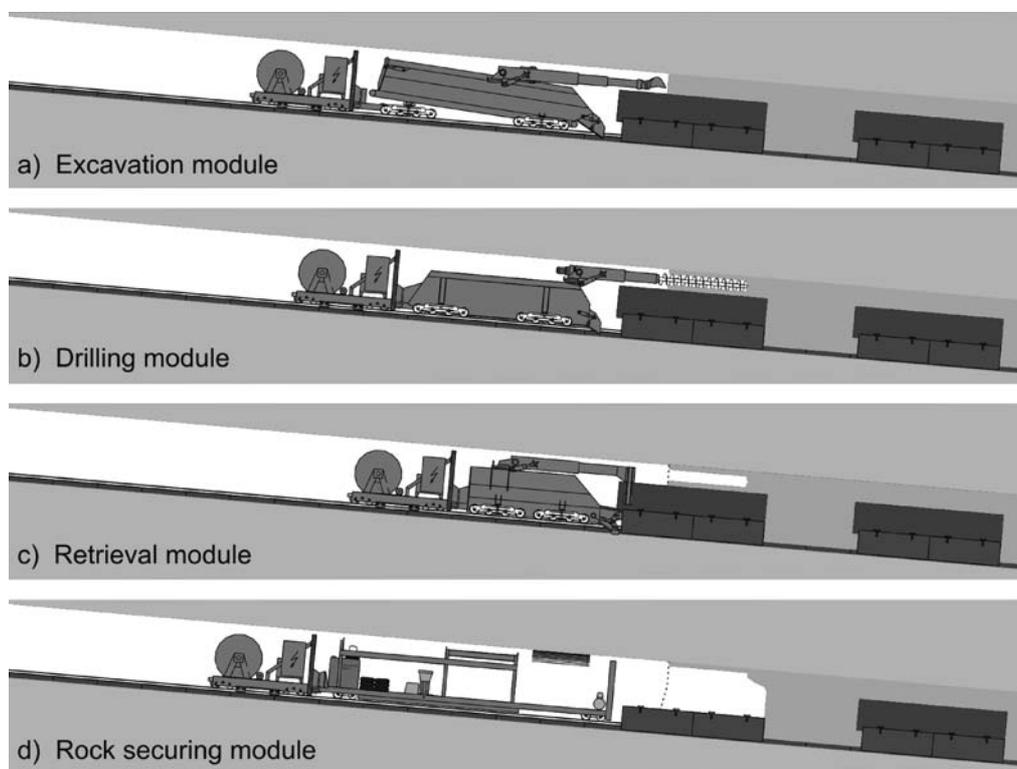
Swiss concept: Recovery of HLW/SF canisters from backfilled emplacement tunnels; procedure and equipment.
